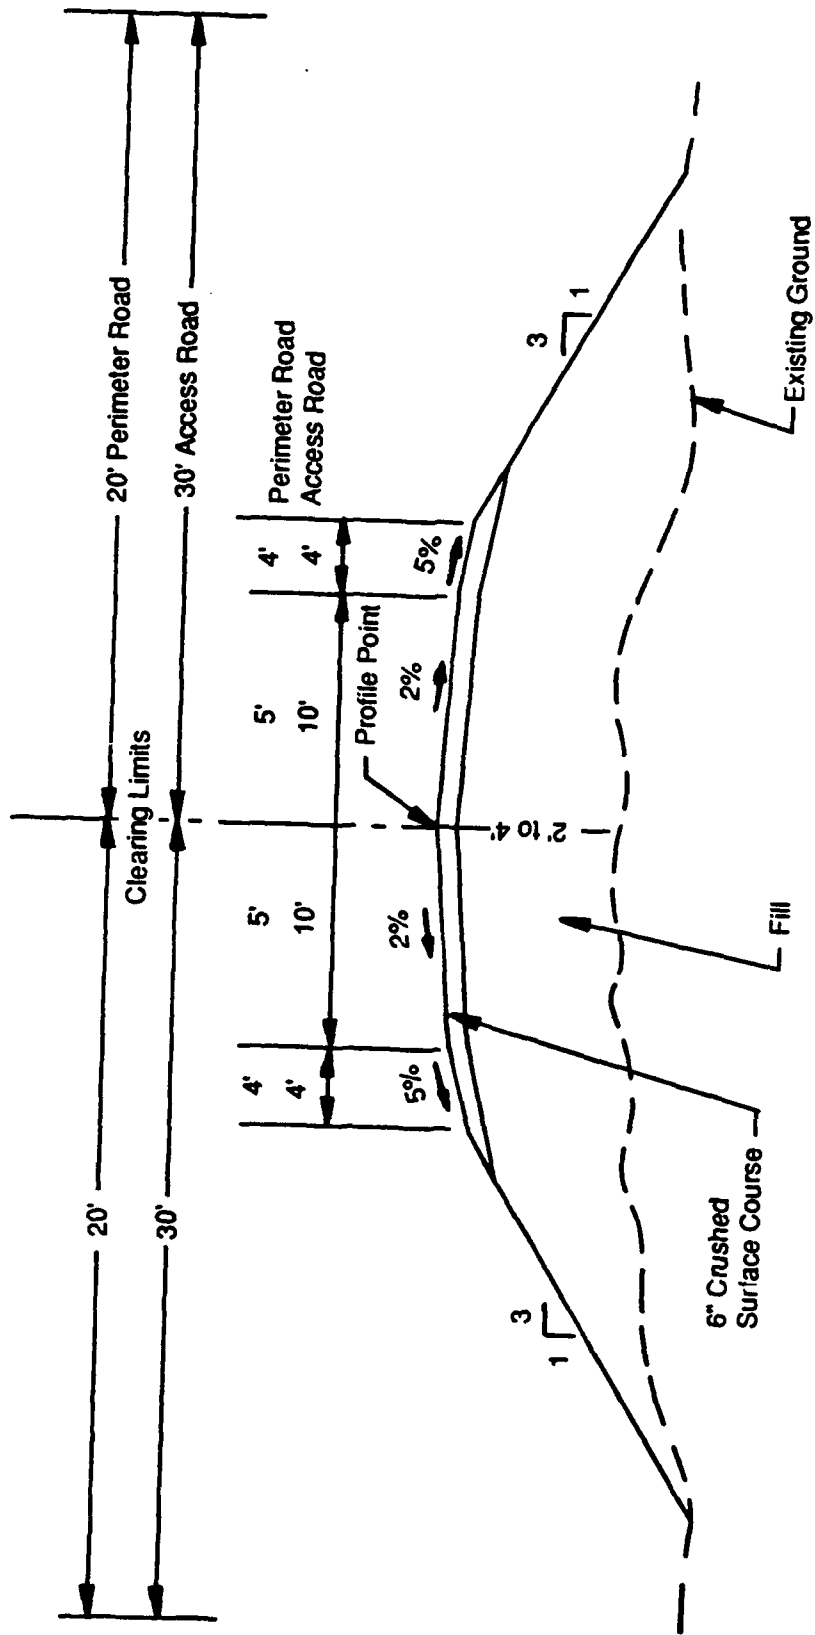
TYPICAL ACCESS/PERIMETER ROAD CROSS SECTION
